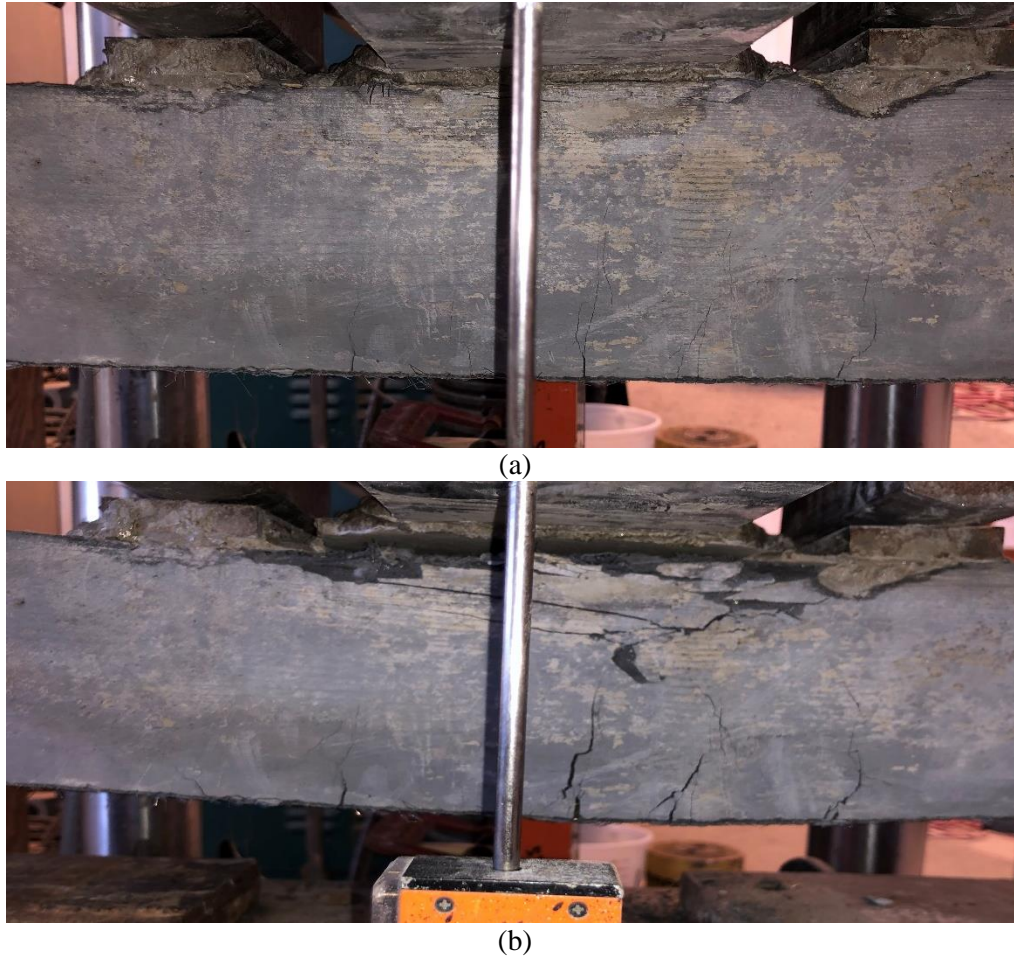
Cracking of specimen 6#3: a) tensile cracking in the pure bending zone b) concrete crushing in larger loadings
